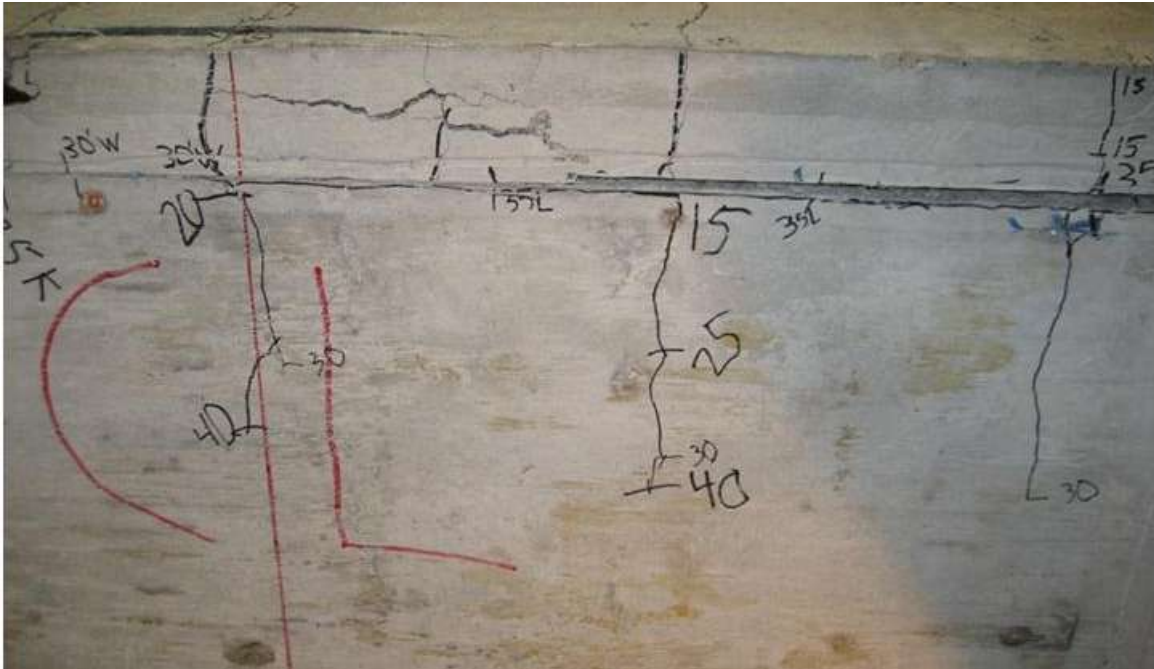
Beam 6, centerline showing separation of concrete, 50 kip end load.
